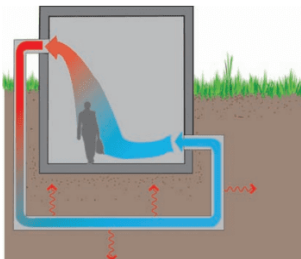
Utilizing closed-loop air exchangers to achieve building cooling.
